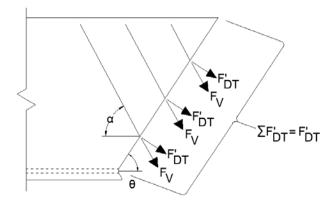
Forces in Stirrups along inclined Crack
